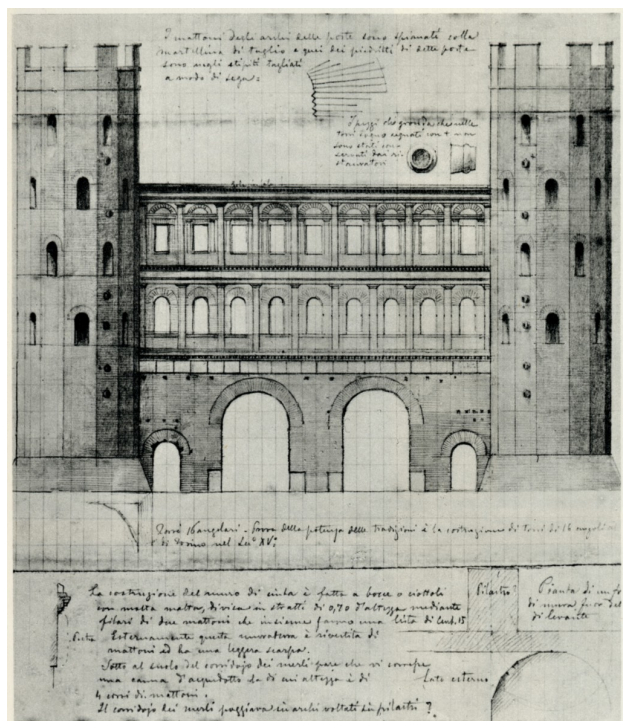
Alfredo d'Andrade, Survey of the gate, 1883. © Fondazione Torino Musei, Fondo d'Andrade.
